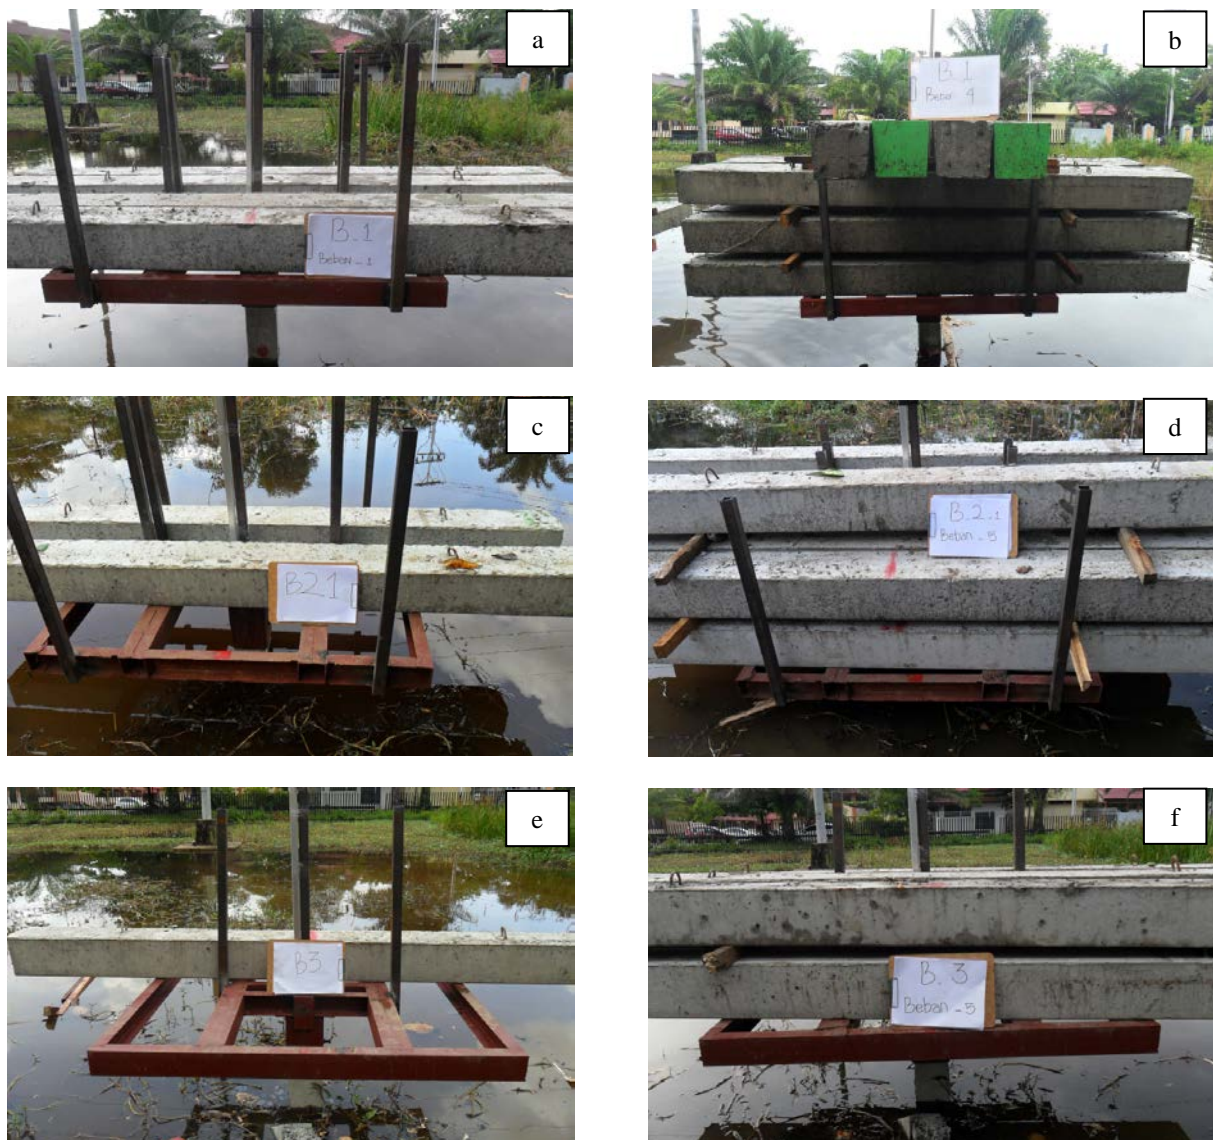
Field loading test process: (a) B1 first stage loading, (b) B1 final stage loading, (c) B2.1 first stage loading, (d) B2.1 final stage loading, (e) B3 first stage loading, (f) B3 final stage loading
